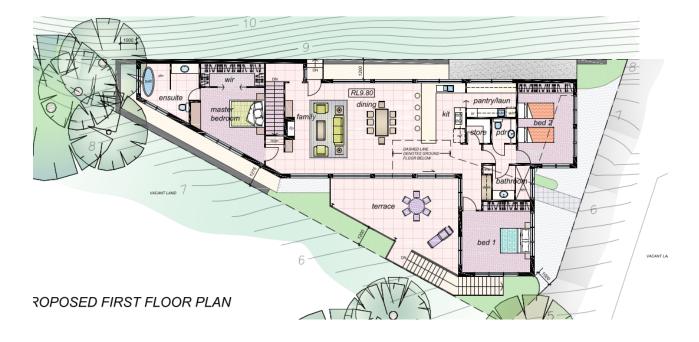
Current plans for 2B Clara Street which were endorsed under 23/2013/P/B
